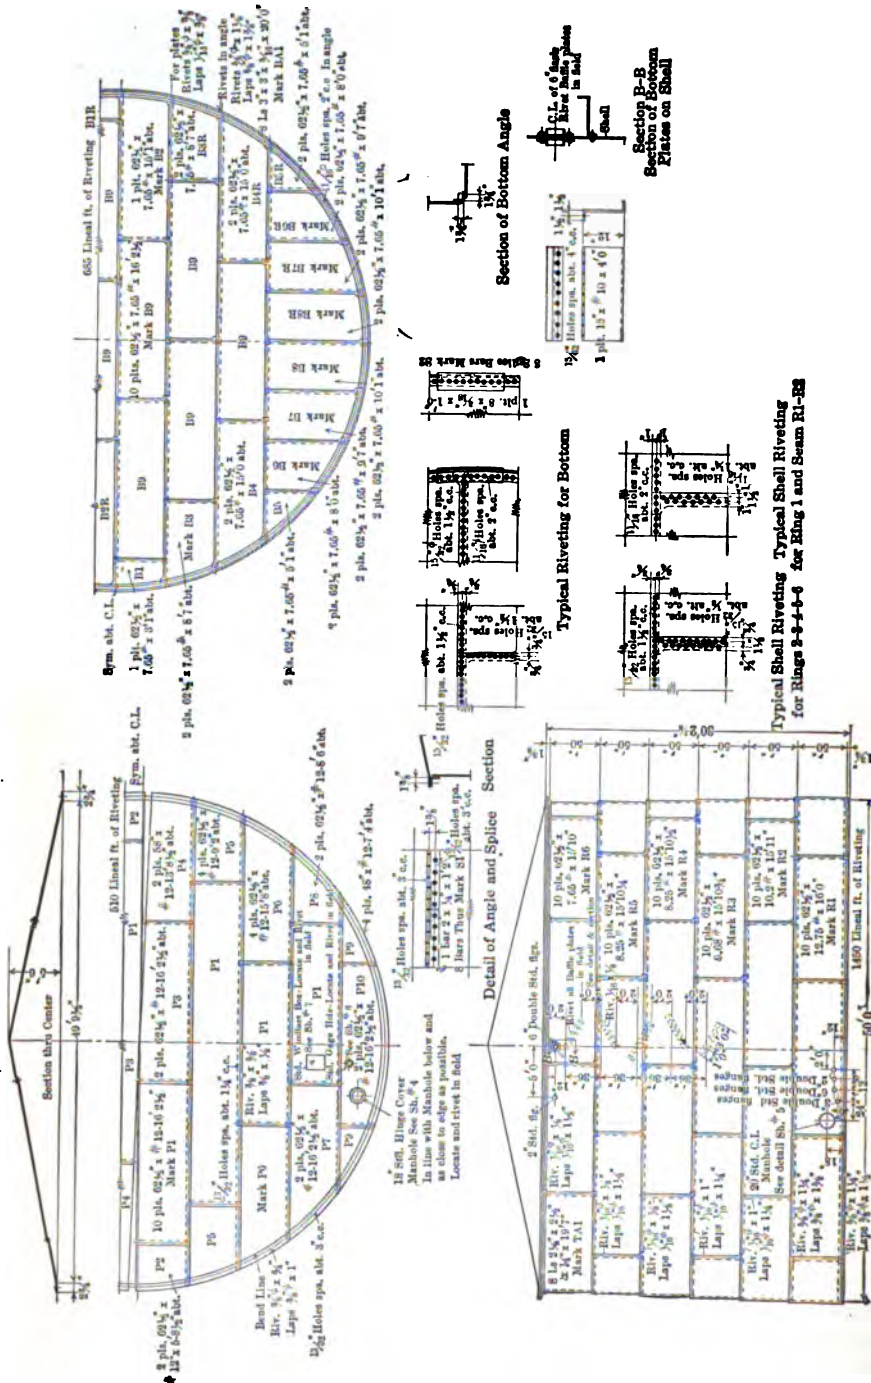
A 10,000-barrel tank, 50 feet by 30 feet.
